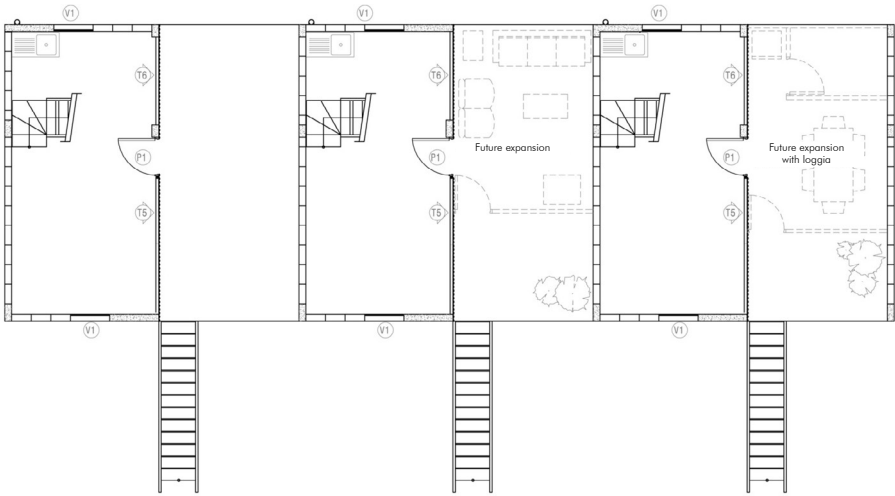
Floorplan 2nd floor [ELEMENTAL, n.d.]
